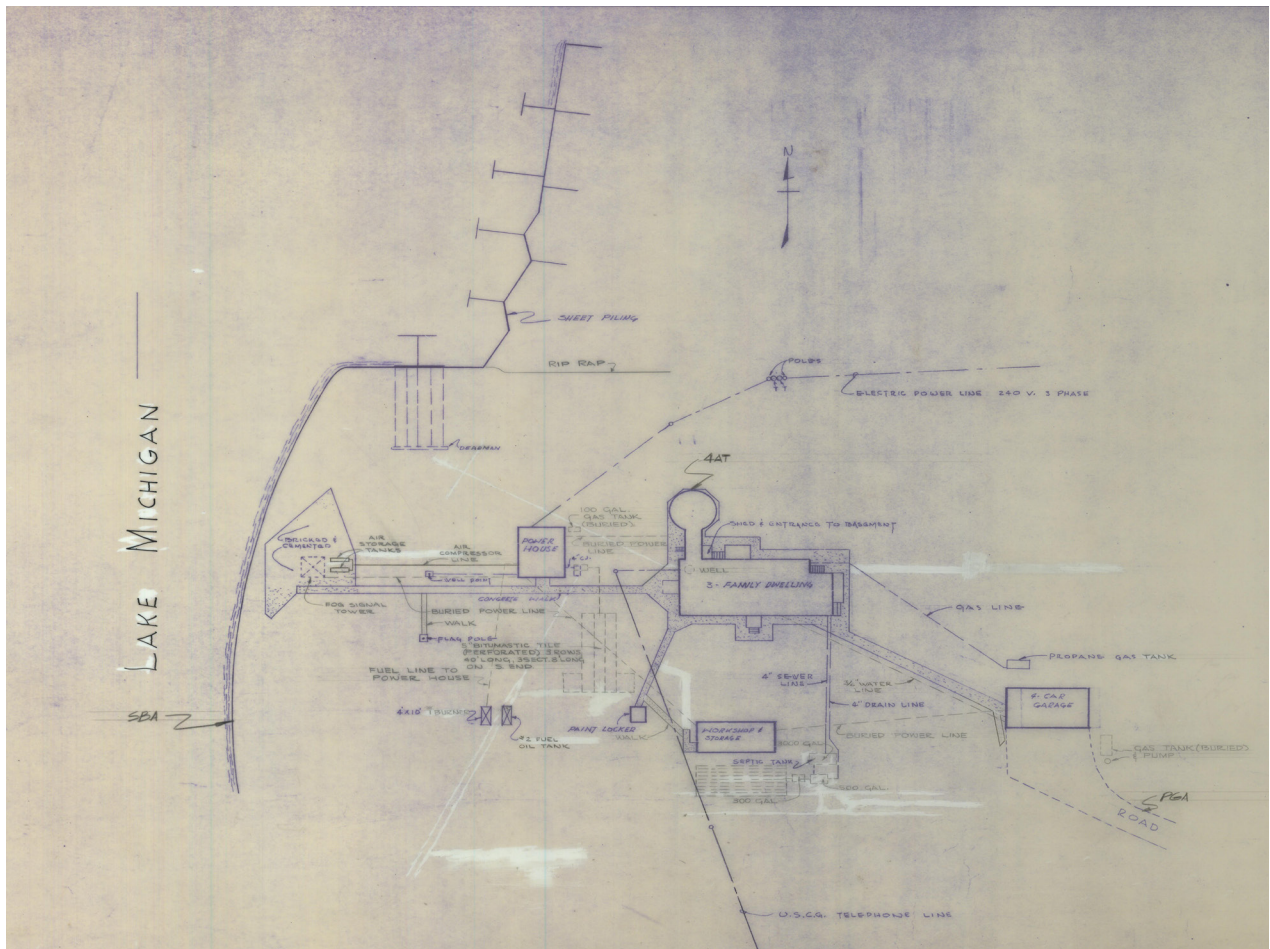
B-81: 1963 plot plan (with updates added 1966, 1967 and 1979) showing the shore protection extension added to the north circa 1962.
